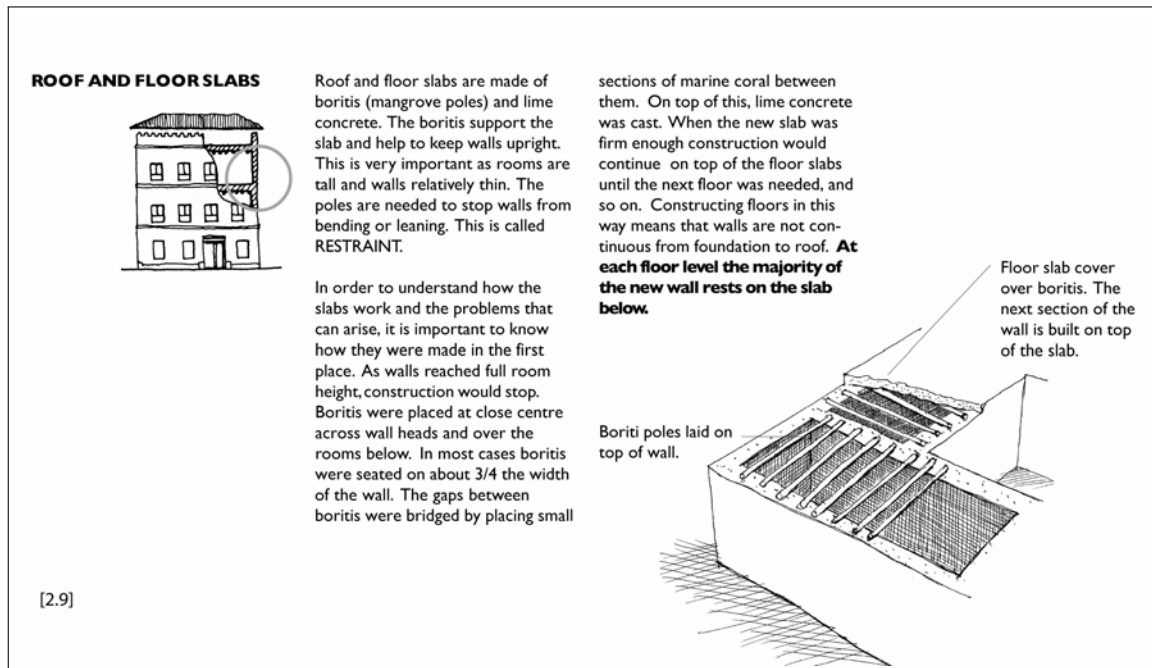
Conservation and Design Guidelines for Zanzibar Stone Town. Roof and floor slabs.
